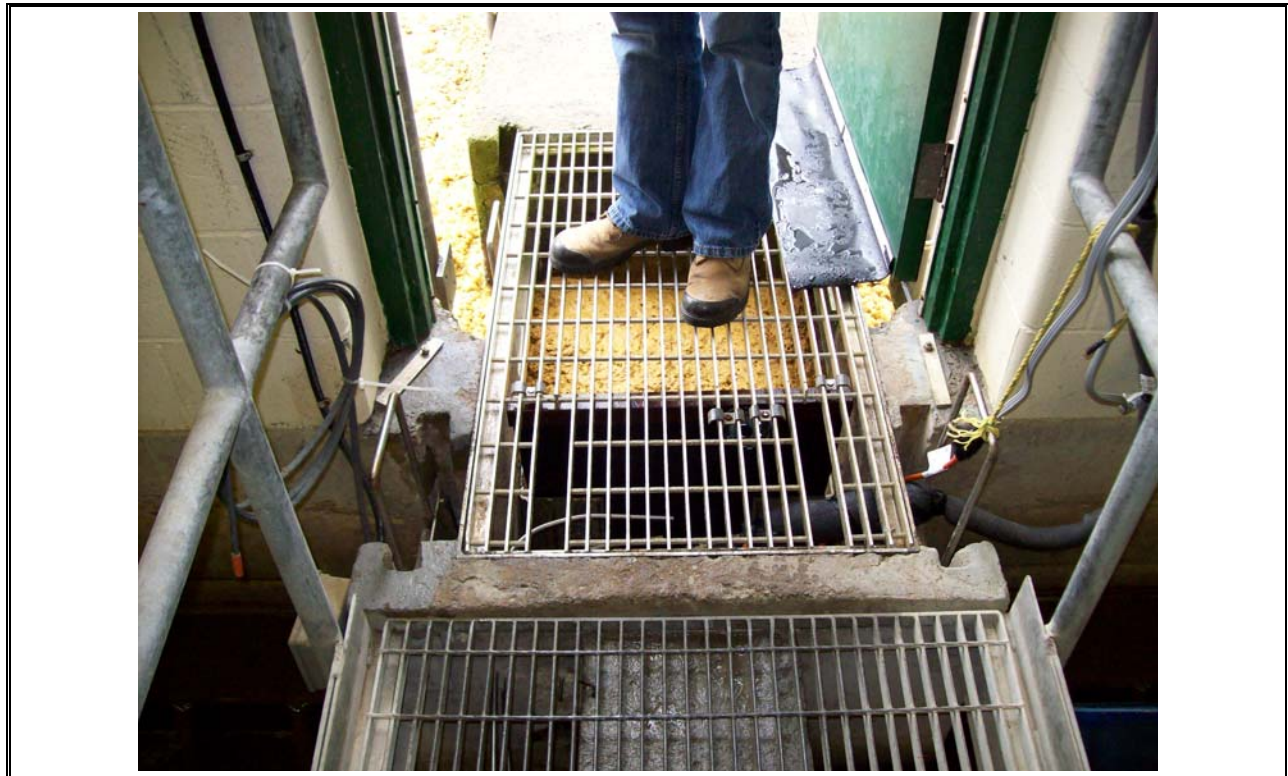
Lockview Aeration Tank Outlet and Clarifier Inlet
